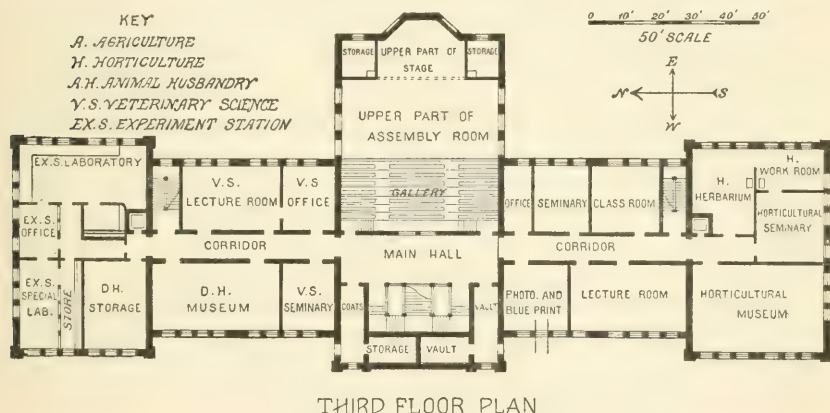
Third-floor plan, Illinois Agricultural Building.
